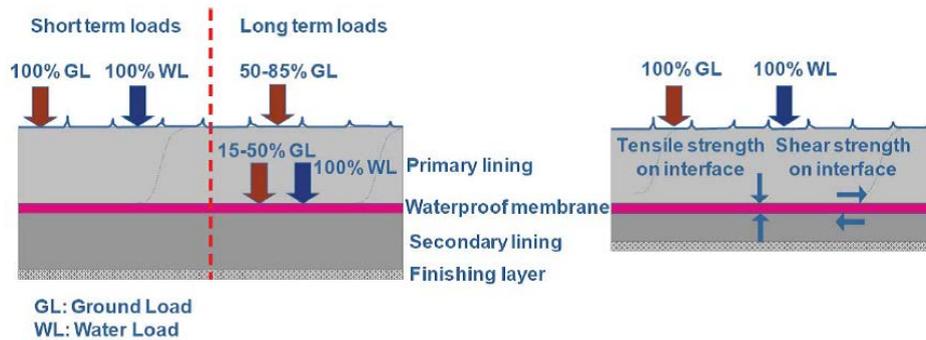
Load conditions for double shell and composite shell tunnel lining (Su, 2013)
